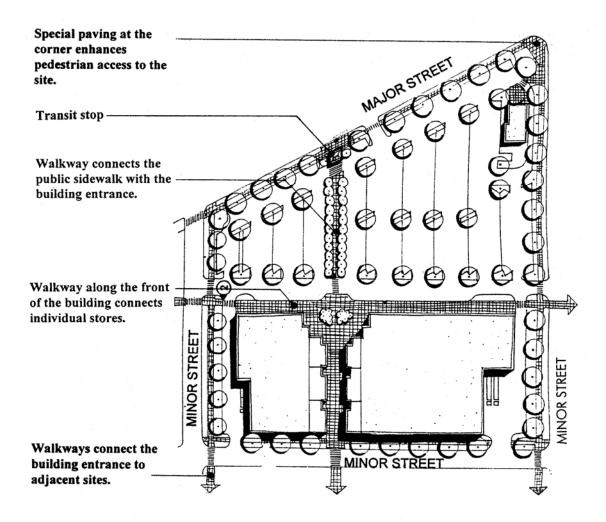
In this large-scale commercial site, wide, landscaped walkways provide pedestrian connections.
